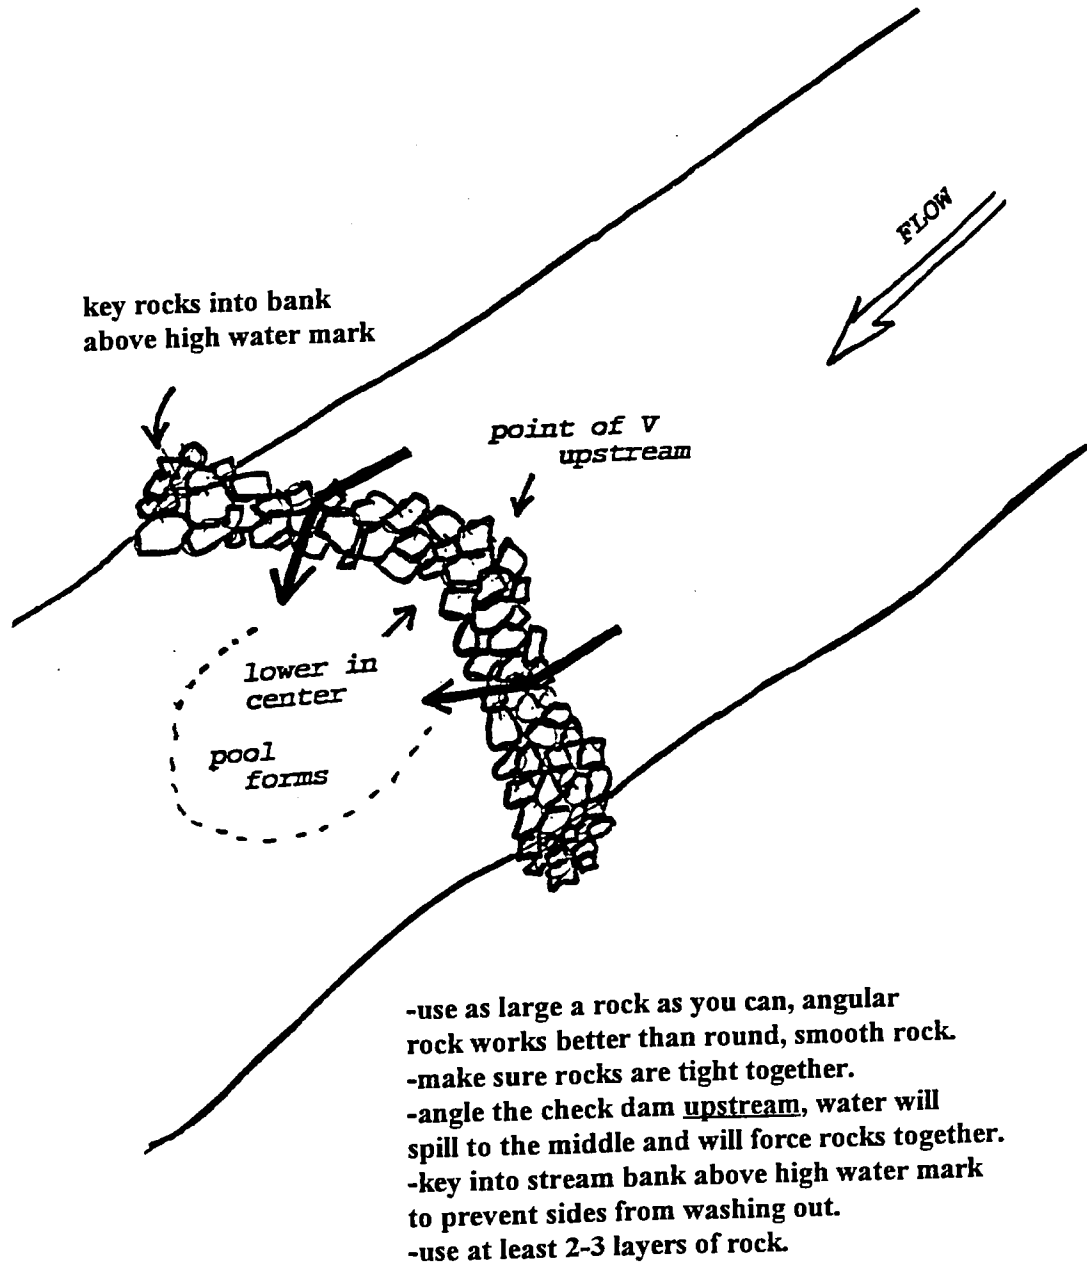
Schematic for the construction of a rock check dam designed to increase water elevation upstream of the dam.
